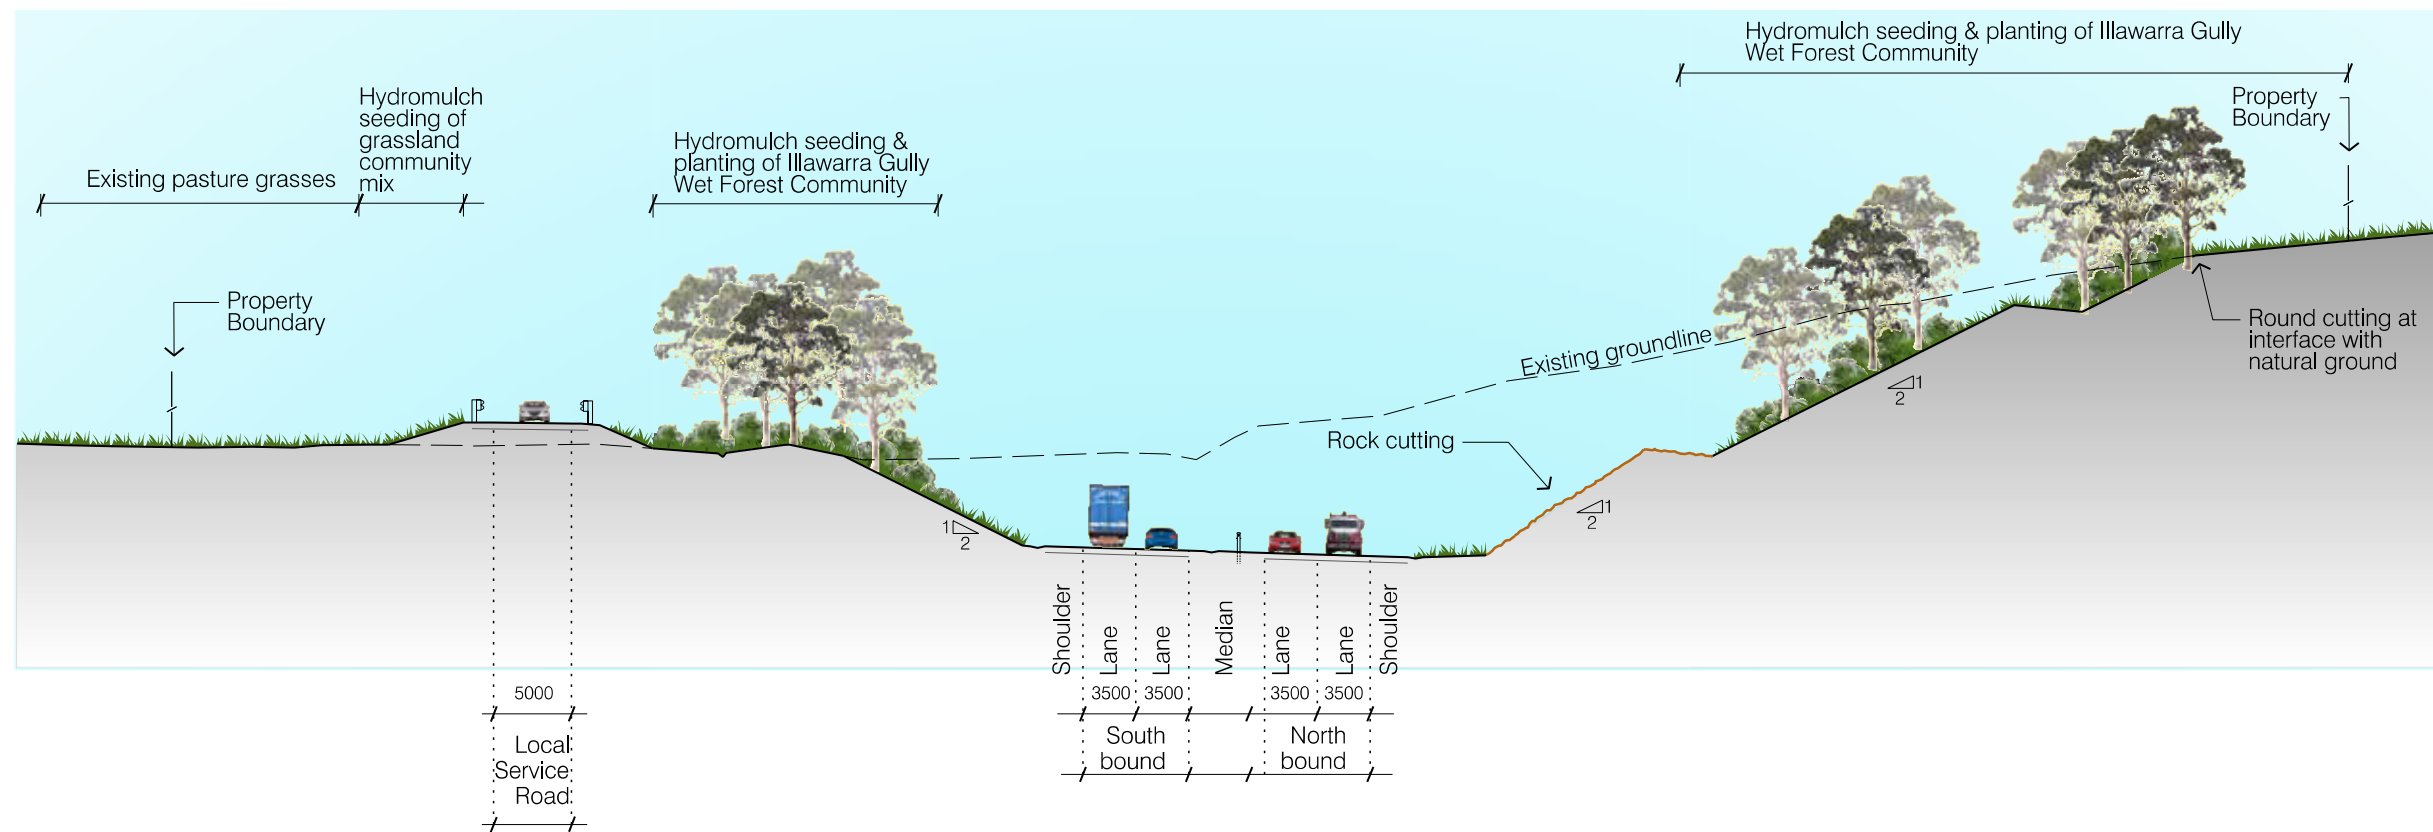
Road cross section at Ch. 13100 (Scale 1:500 @ A3)
